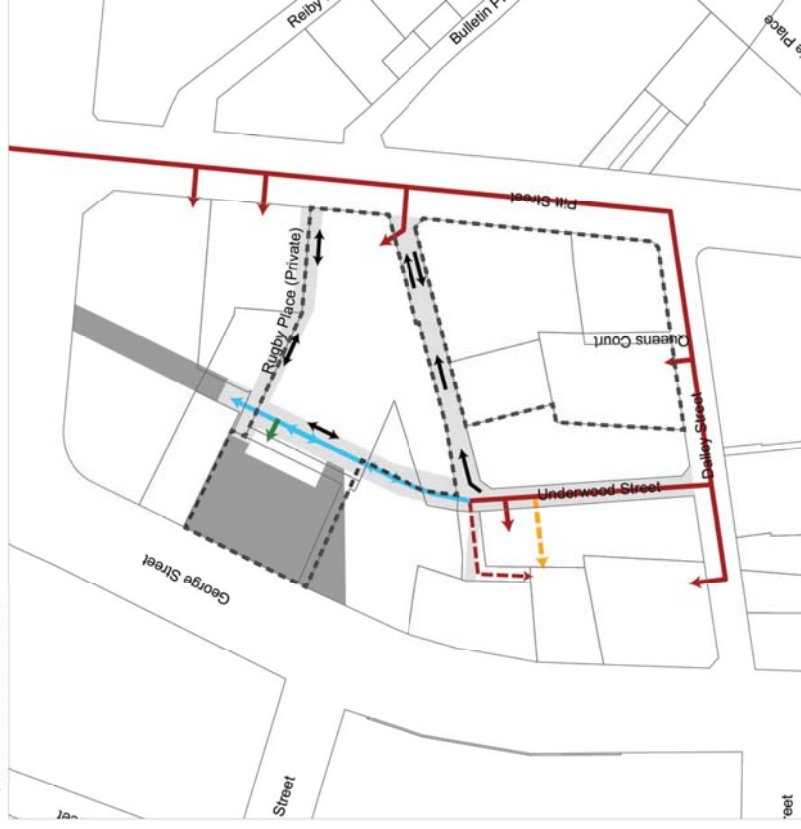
Vehicular Access Plan - Proposed Figure 6.16A
